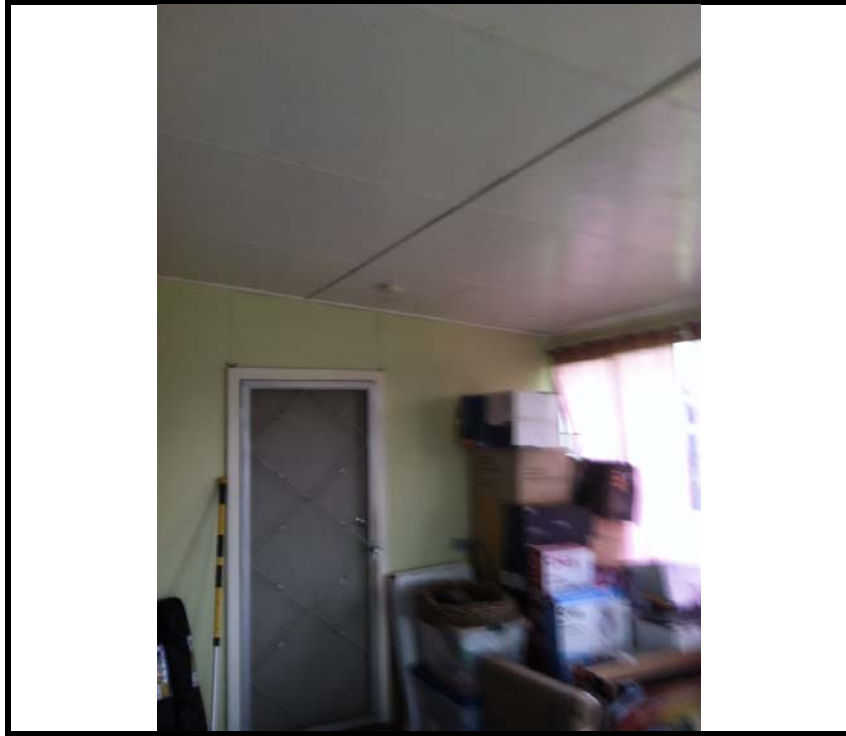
16 Bowditch Avenue – ACM sheeting lining the walls of the bathroom in the house
